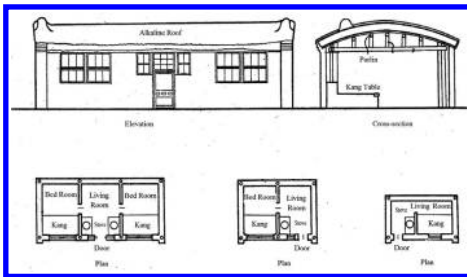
Elevation, cross-section, and plan of typical alkaline soil dwelling.
